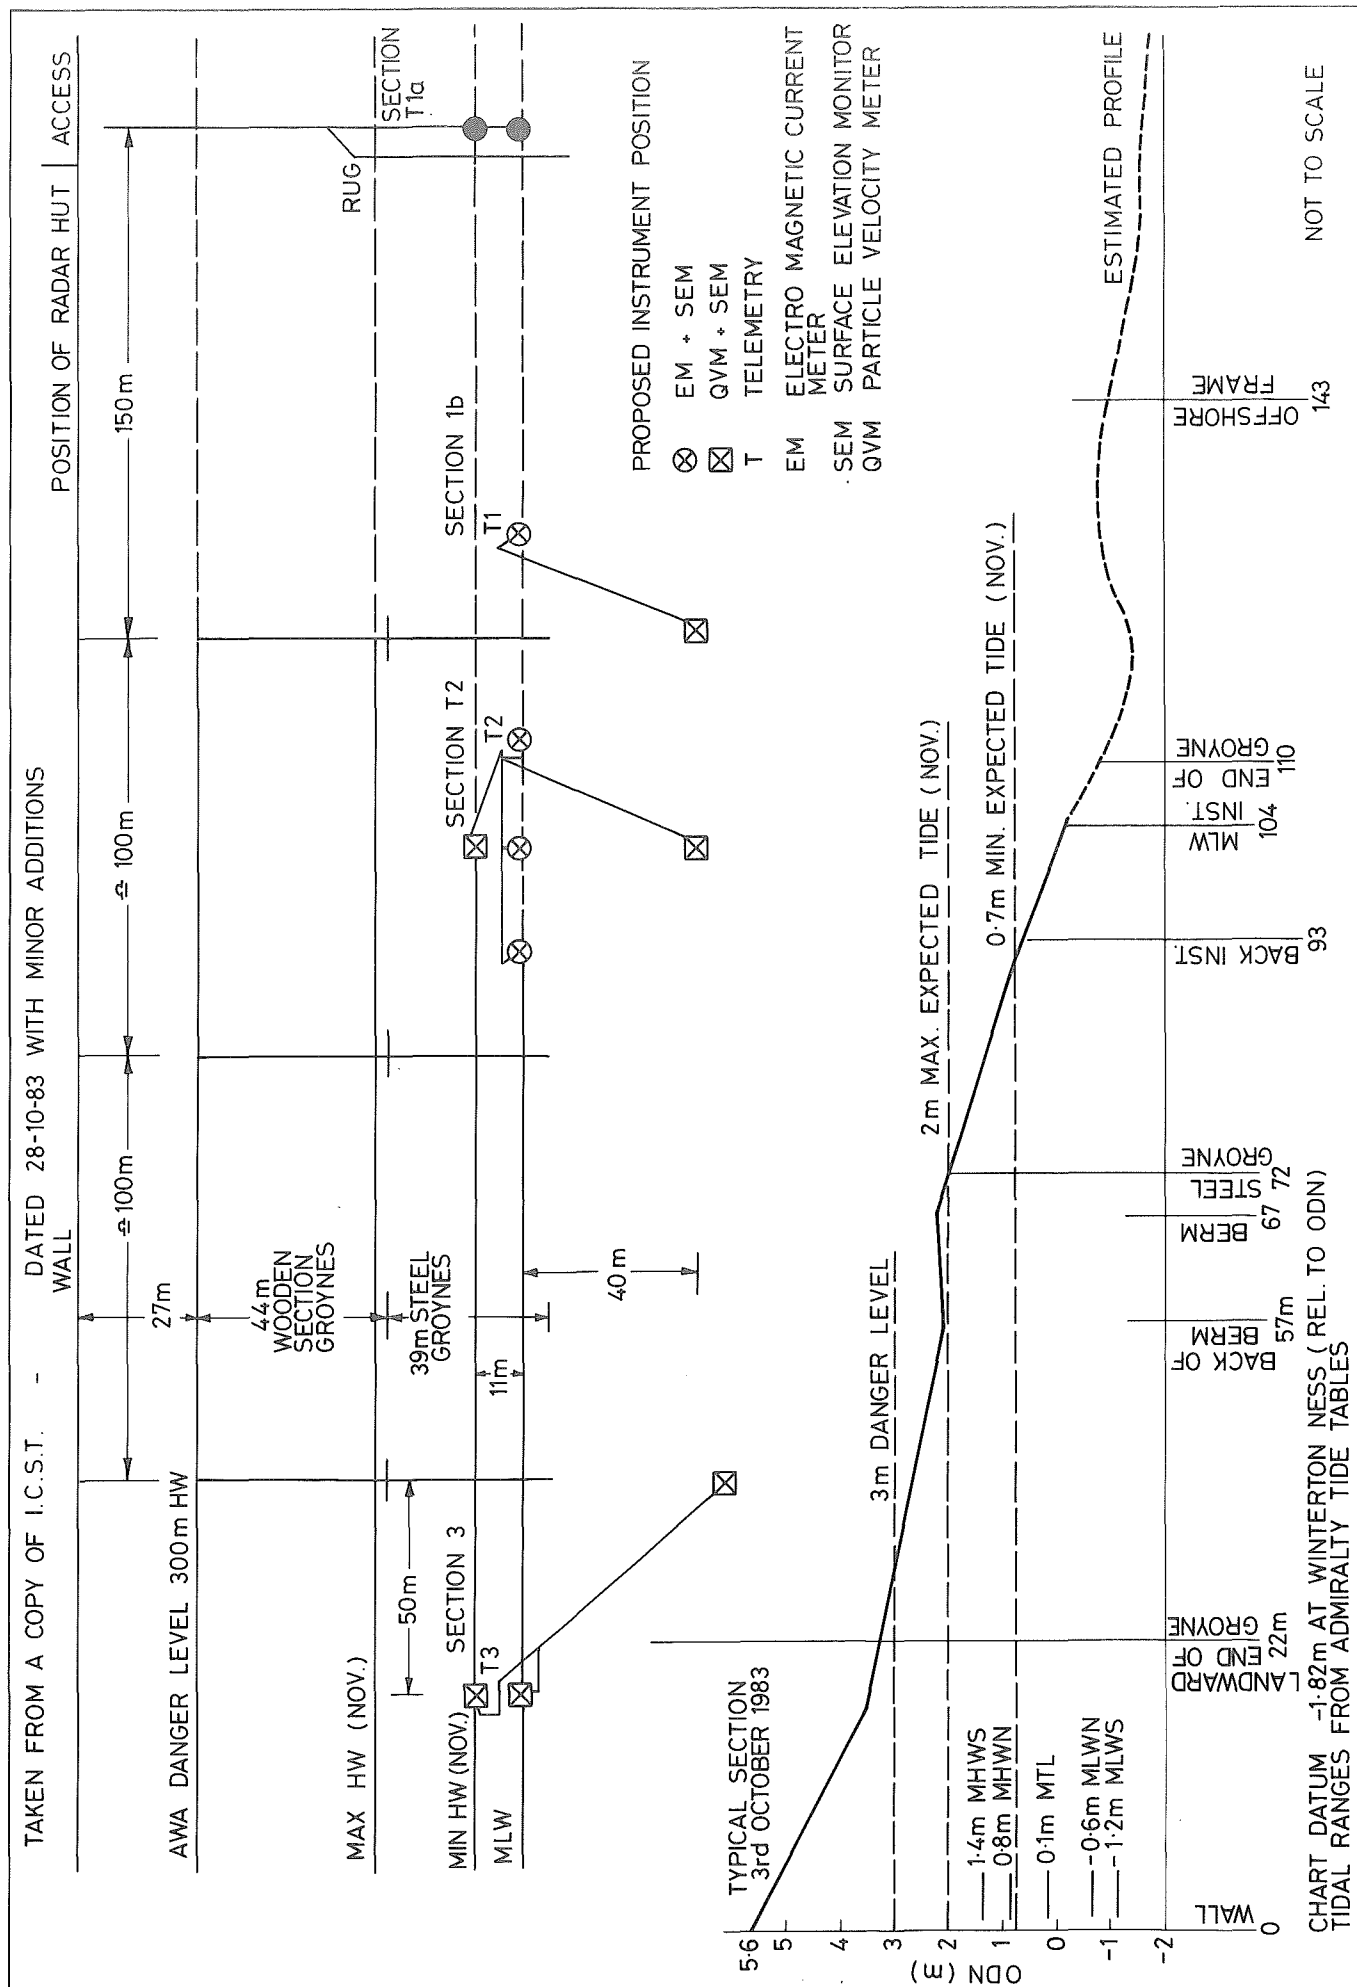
Plan and section of Sea Palling site (October 1983)
